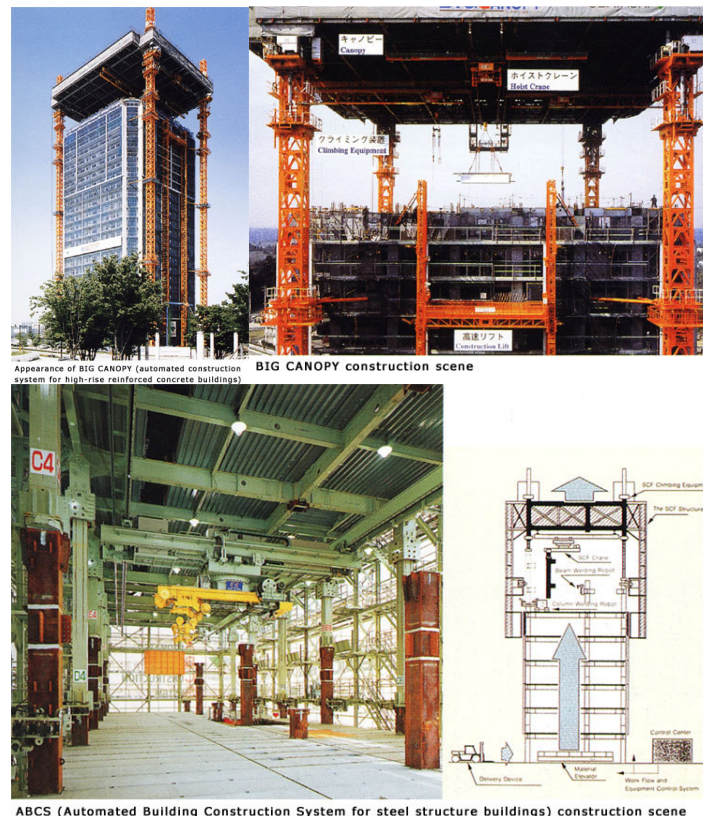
The Big Canopy- An automated building construction system (Url-8)
